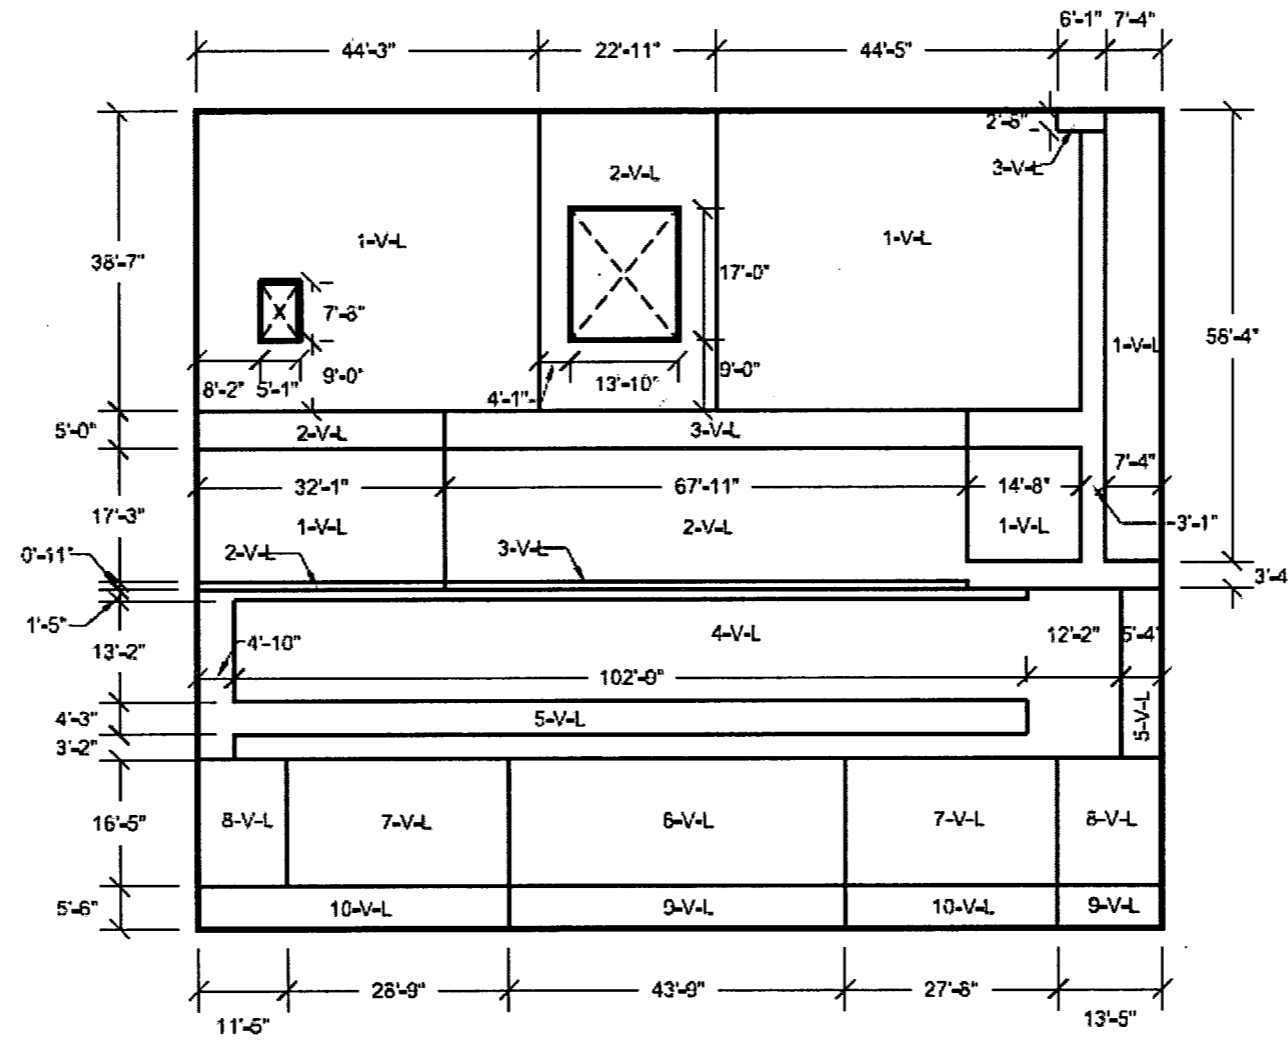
H.3-16; SOUTH WALL LOOKING NORTH
